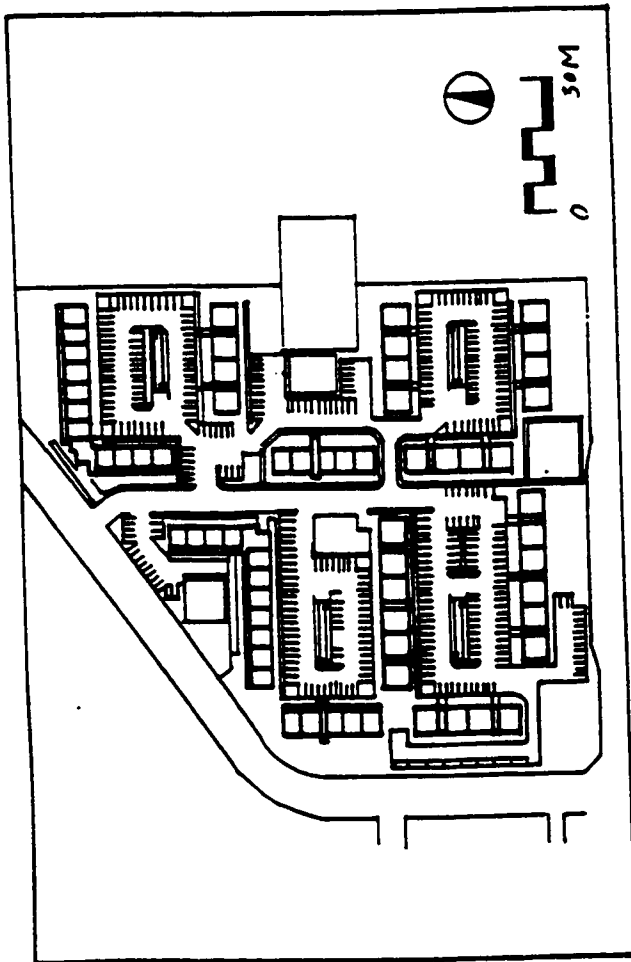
Site layout plan of Suse Samsung apartment complex
